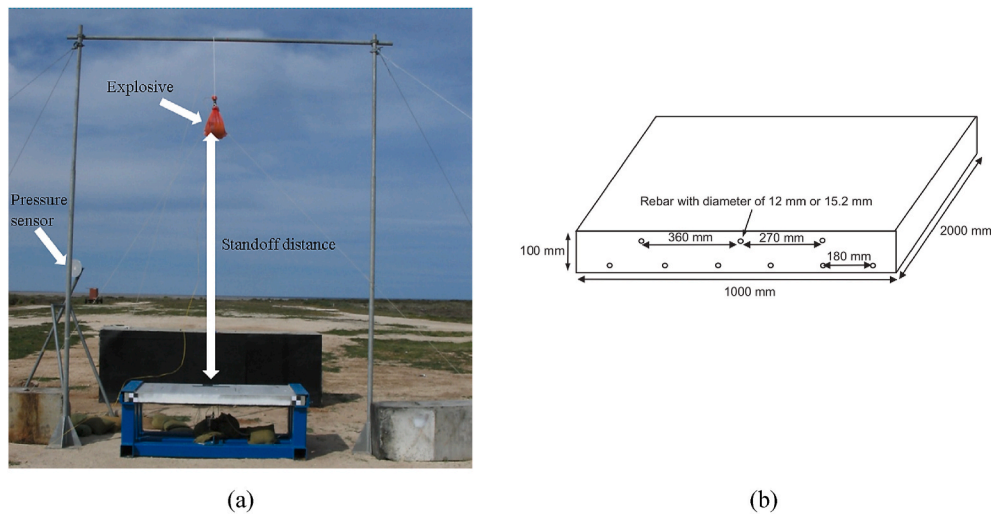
Slab configuration and reinforcement; (a) experiment setup, (b) the schematic representation of UHPC slab and reinforcing rebars (the figures are adopted from Ref. [17]).
